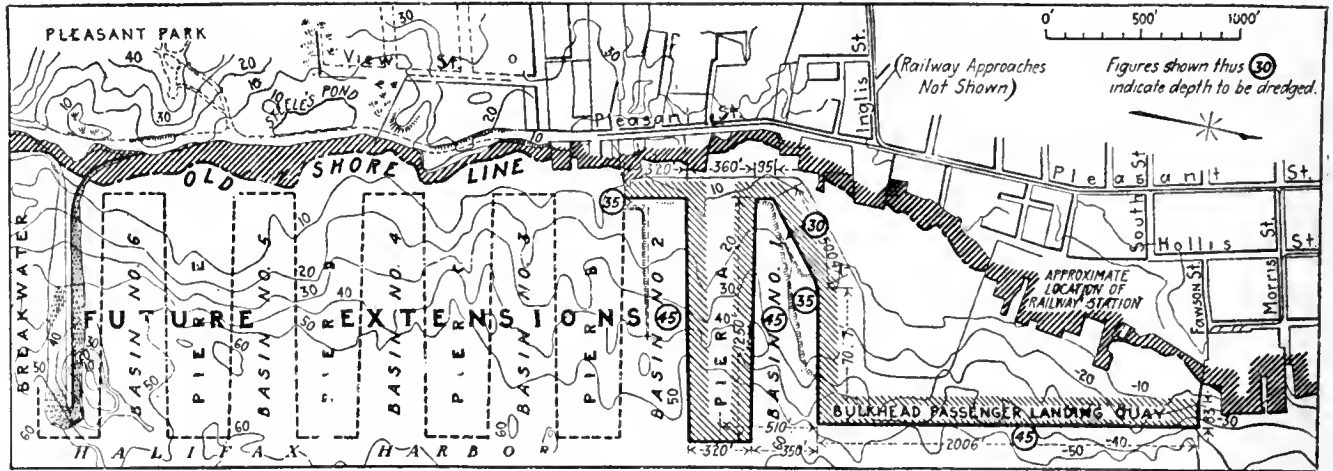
Halifax Ocean Terminals—showing Layout of Quay and Piers and location of Railway Station.
